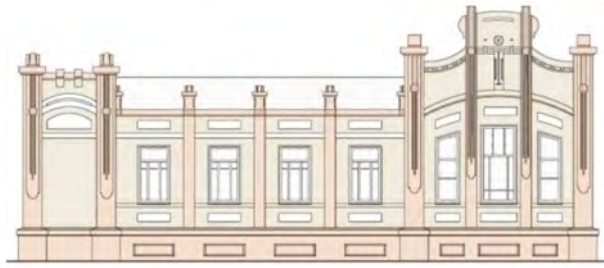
Merchant Kiyatkin's apartment building. Facade in axes 1-5, measurement of the building in 2015.
